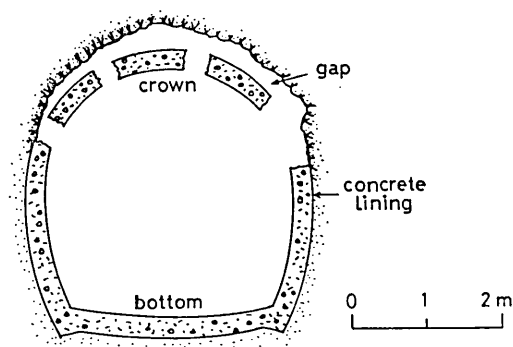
A typical cross section of the water tunnel (KANSAI ELECTRIC POWER CO., LTD.). As shown in this figure, the roof of the tunnel was frequently broken down because of a gap above the concrete lining at the crown.
